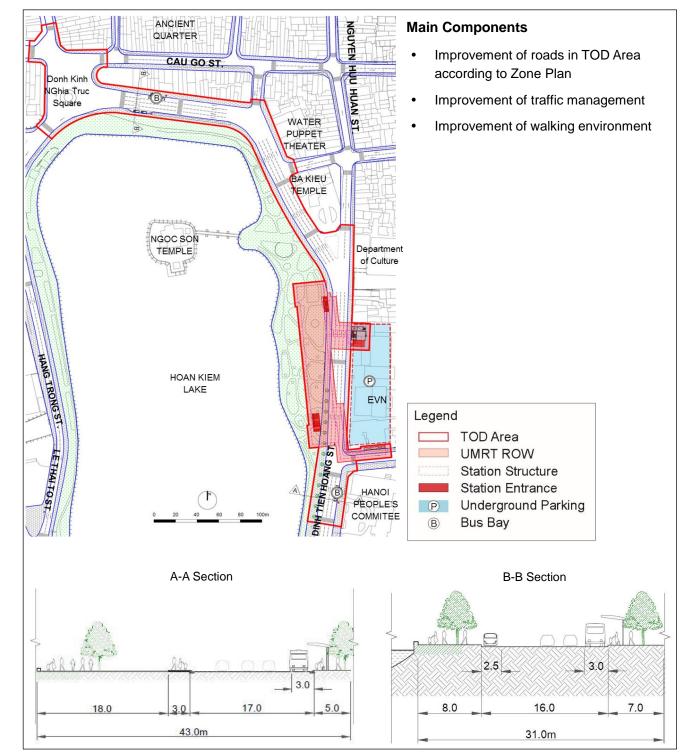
TOD Facilities Plan for Hoan Kiem Station (C9) Area
